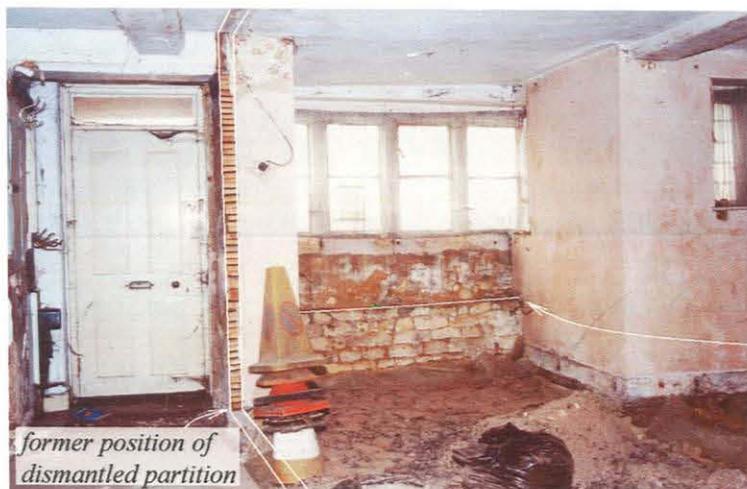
Lounge 65/4, no.65; looking west towards the large, modern casement set within the end gable wall.
